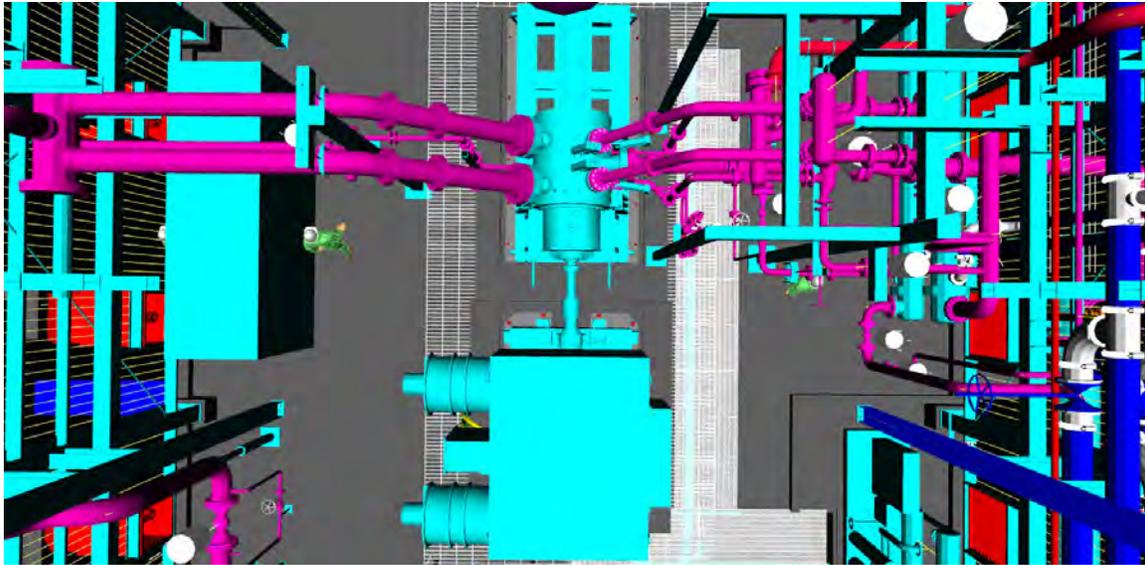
Close-Up of Motor/Compressor Arrangement
